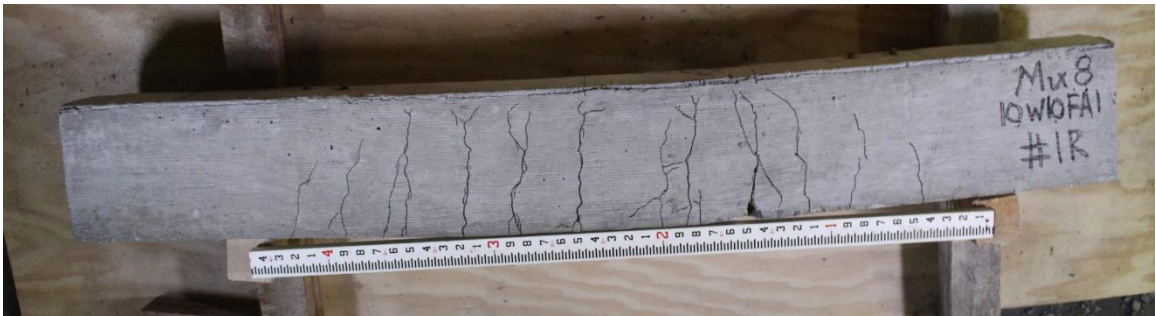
Mixture 8 (10W10FA1) beam #1R: concrete beam side view.
